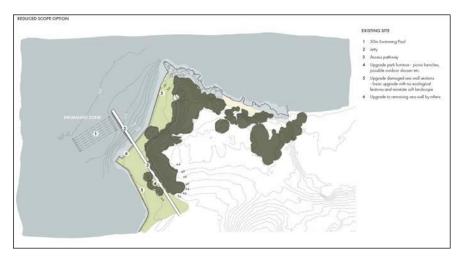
Early concept plan – Callan Park Preliminary Swim Site Design
